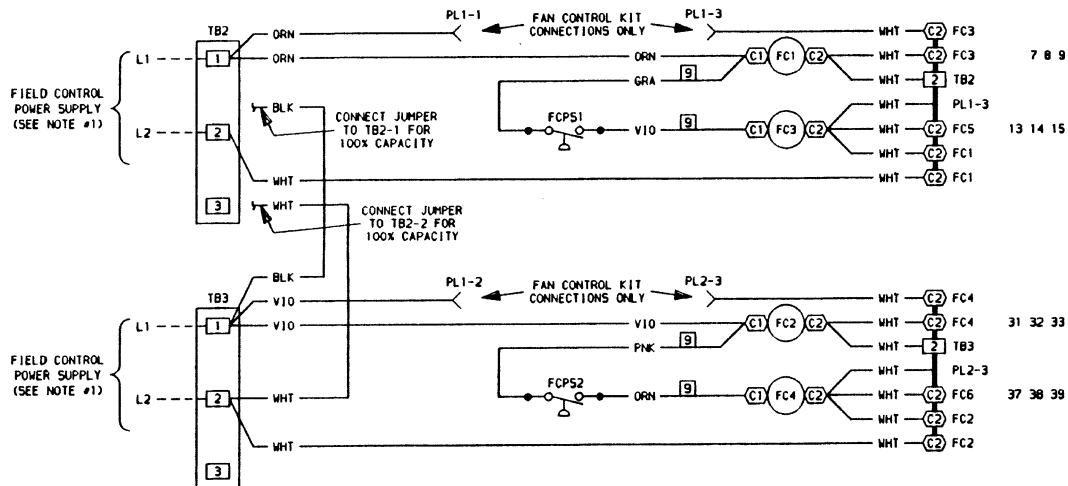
Wiring Diagram and Component Arrangement; 054 and 064 Units
